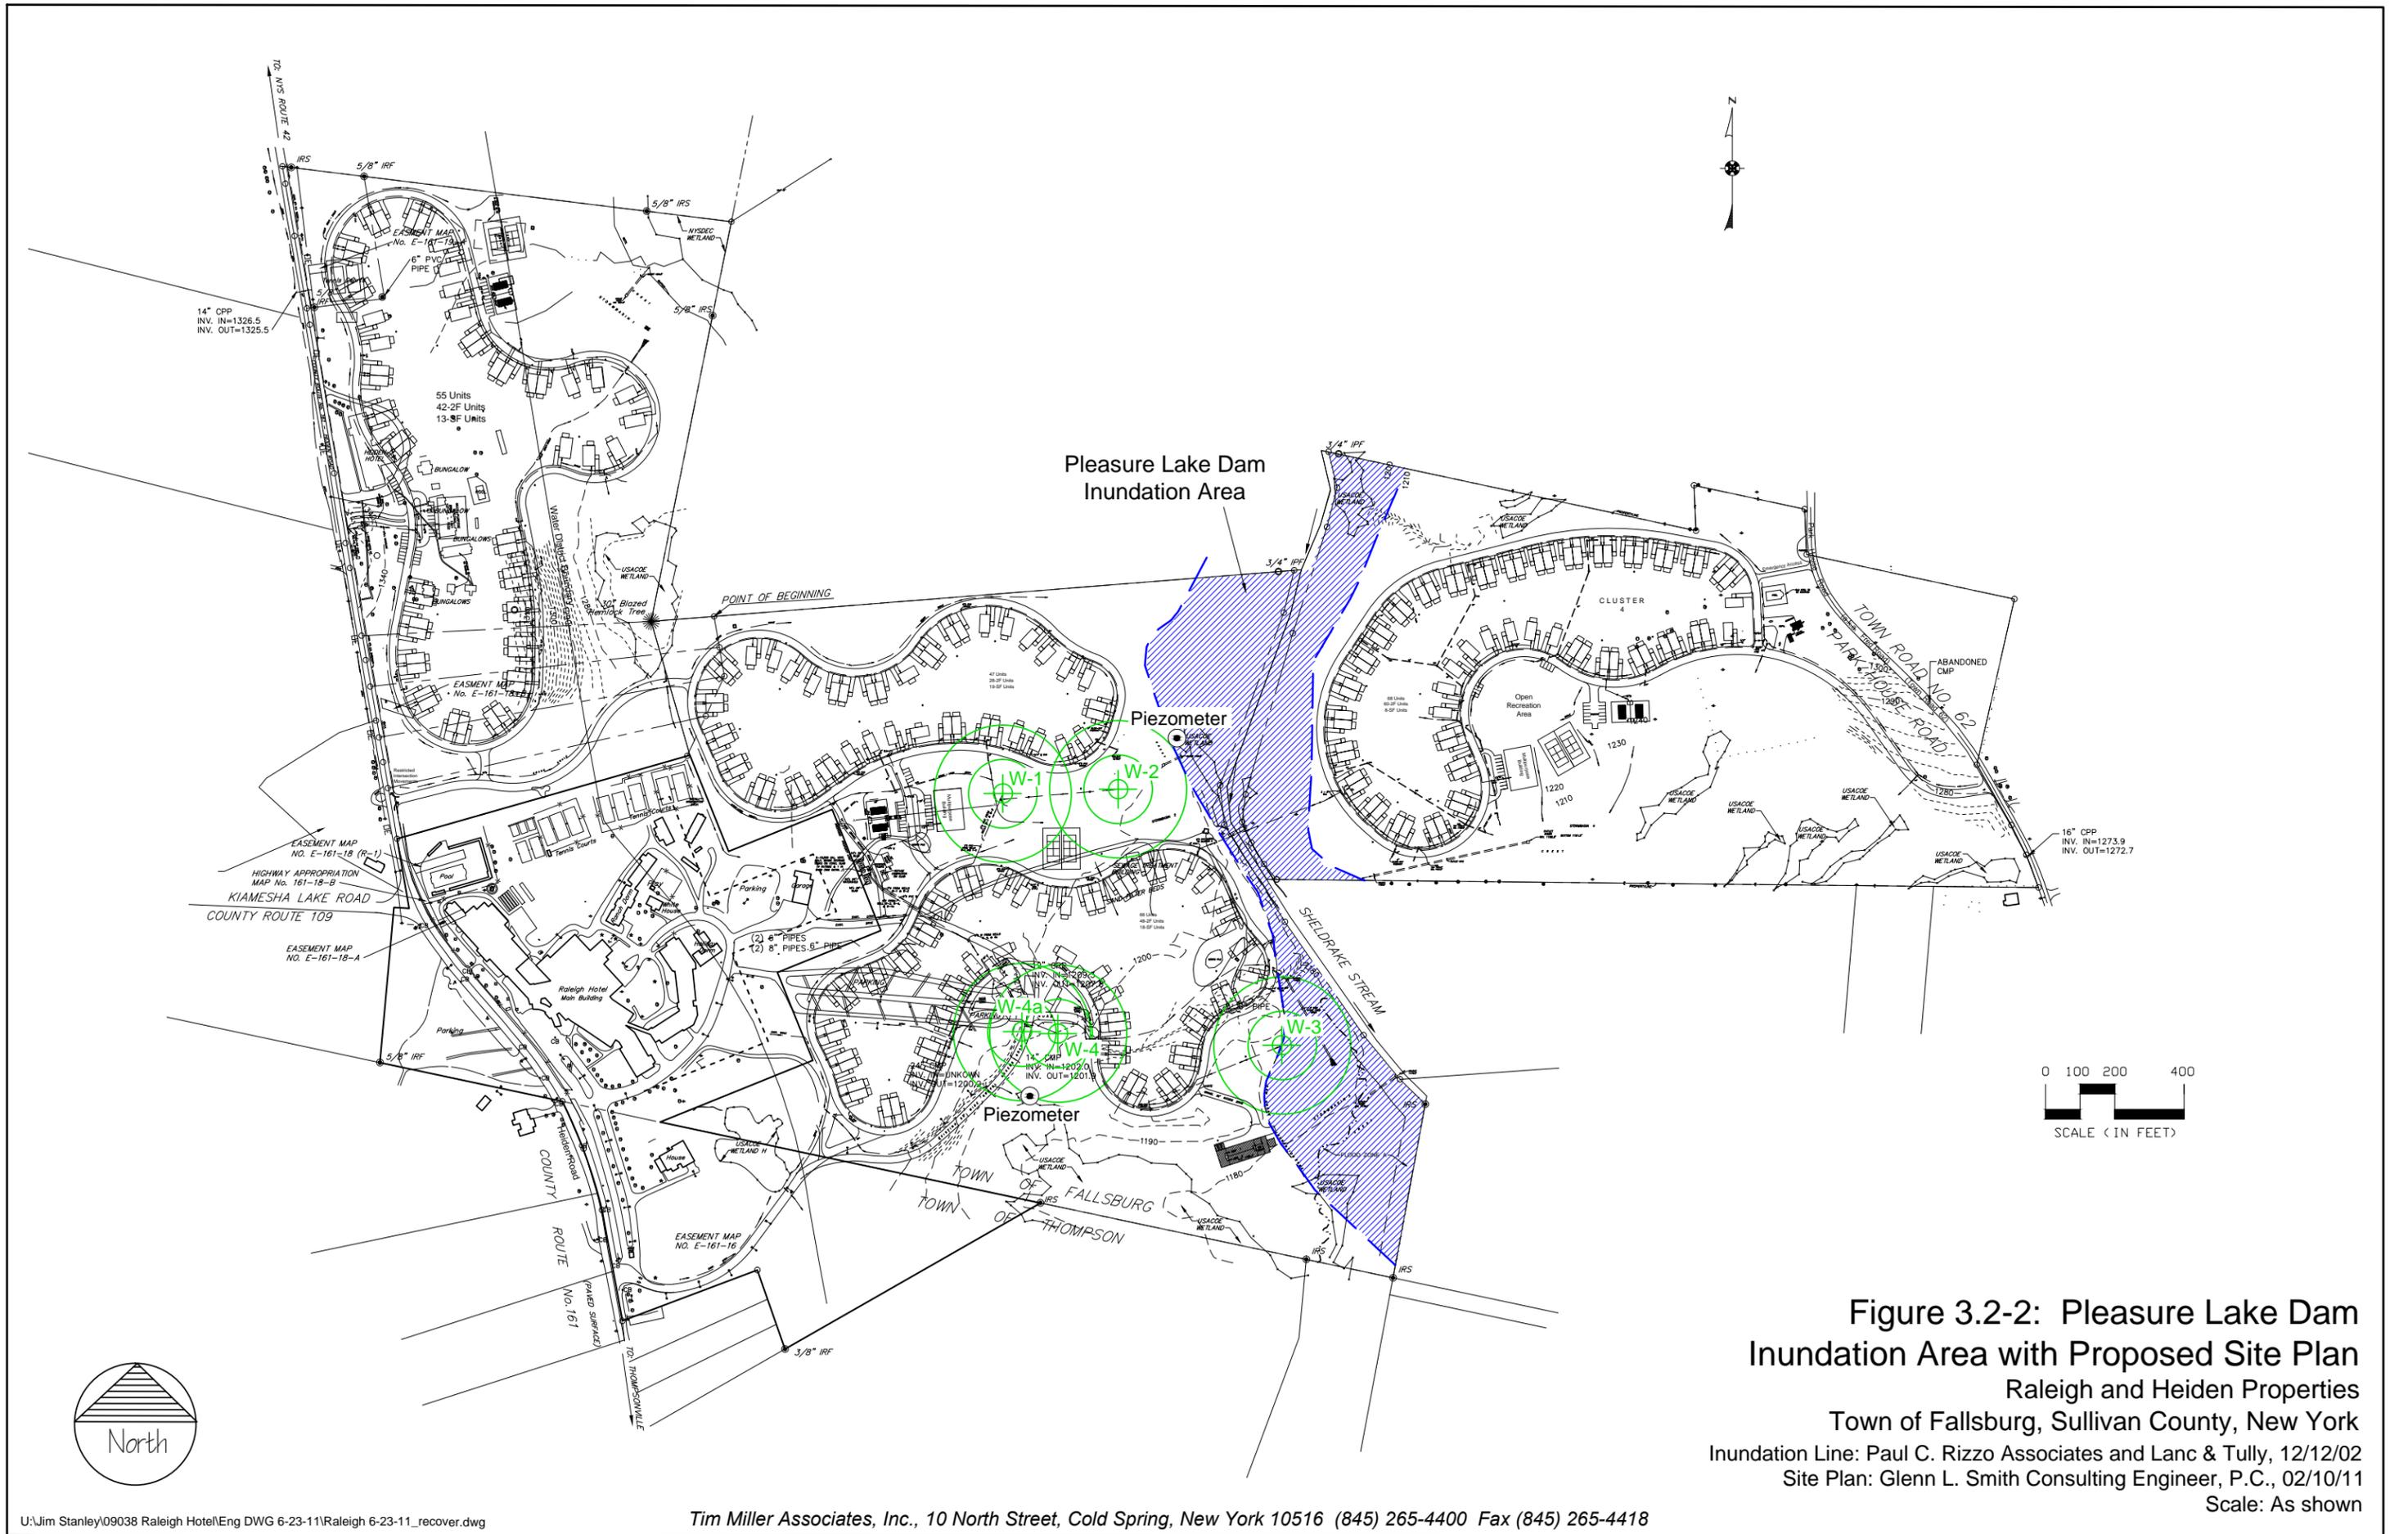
Pleasure Lake Dam Inundation Area with Proposed Site Plan
